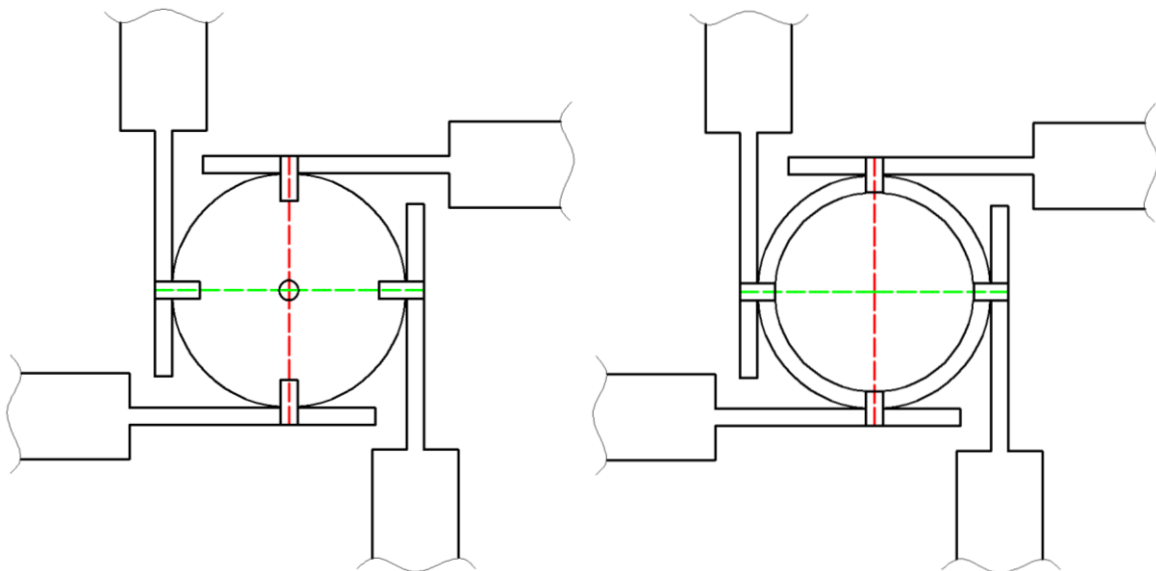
Geometrical representation of the core-and-pin joint: cylindrical prism (left), circular hollow section (right).
